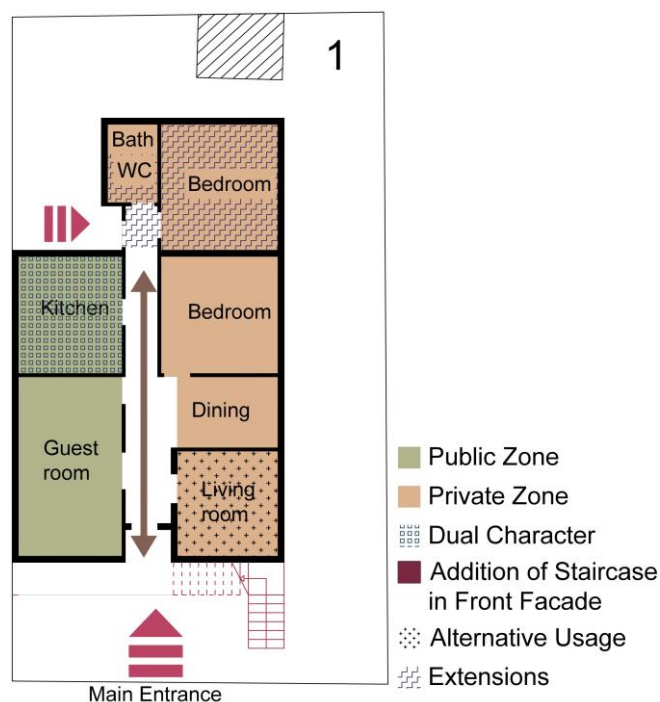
Ground floor sample for leading type I with front façade staircase (Author, 2017)
